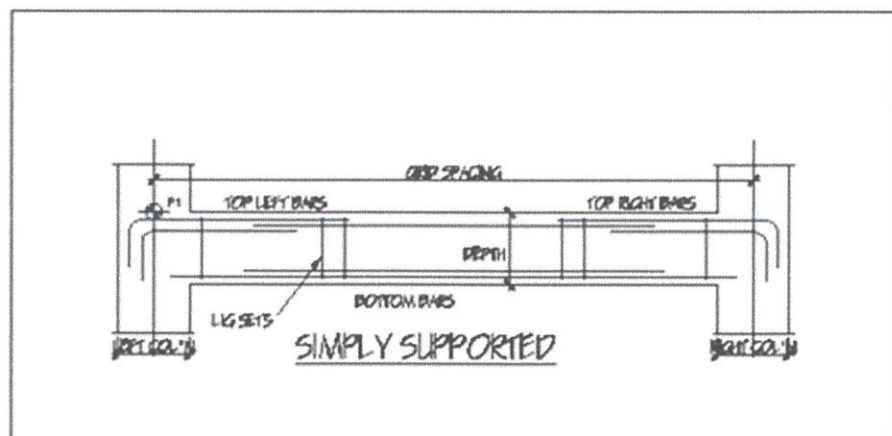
An example connection of Reinforcement bar between ground beam and column stump.
